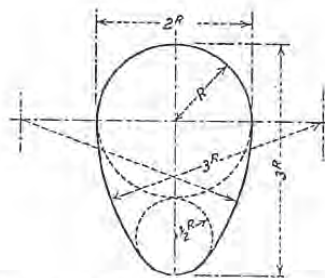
Standard Egg-shaped Section for Brick Sewer.
